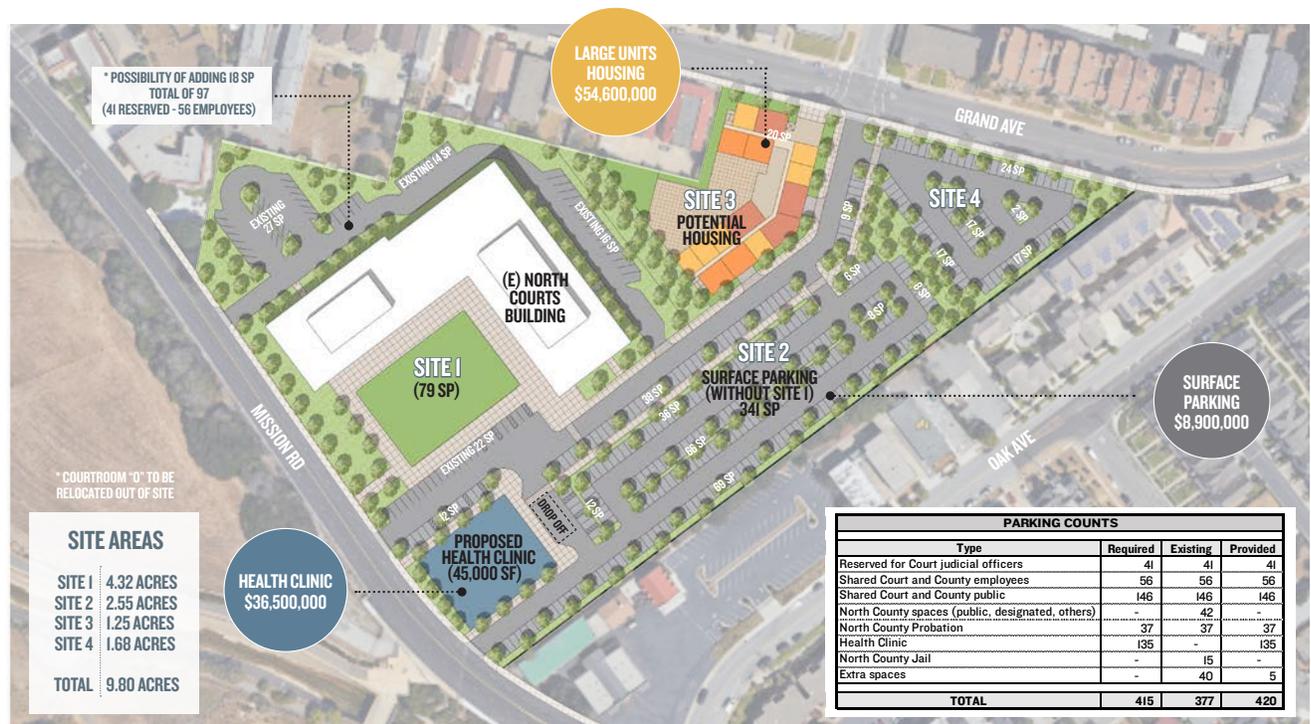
Option 5. Mission Road Clinic Location / Surfaced Parking
